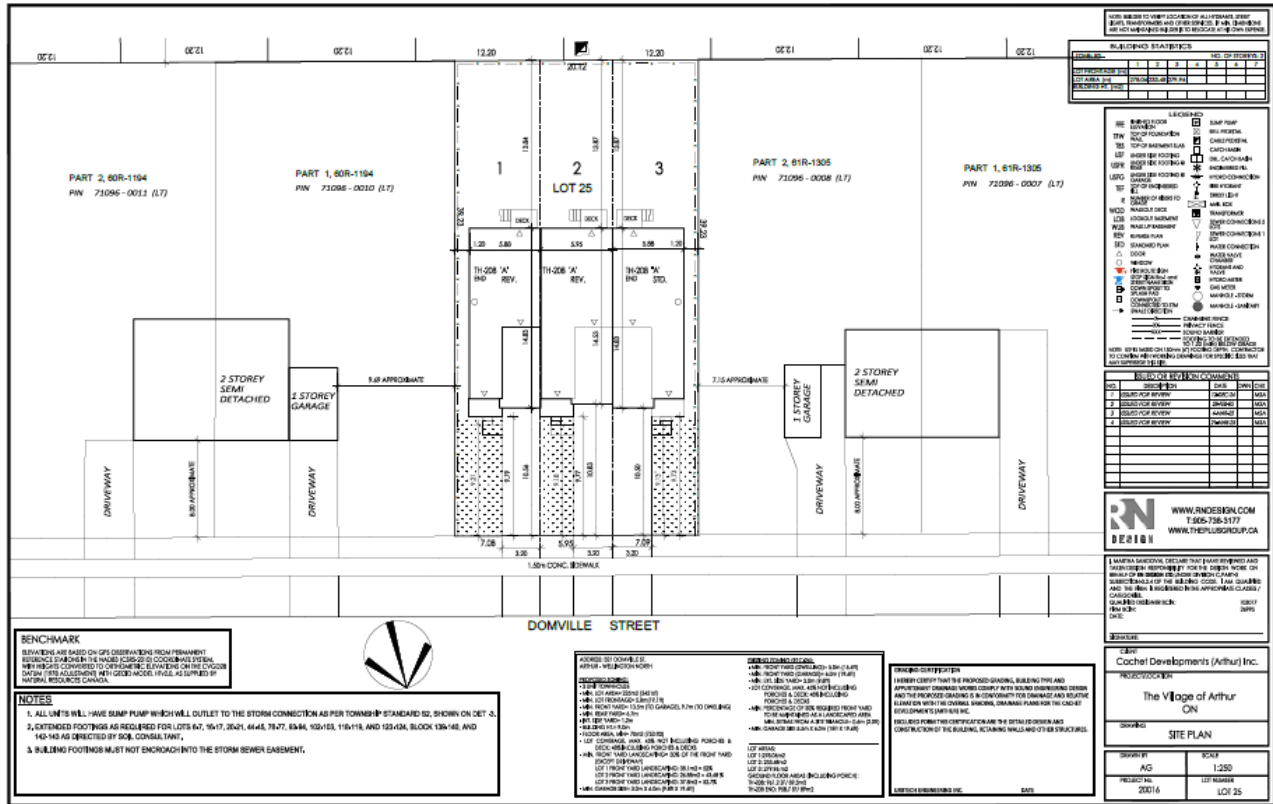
Revised Site Plan prepared by RN Design dated March 21st, 2025.
